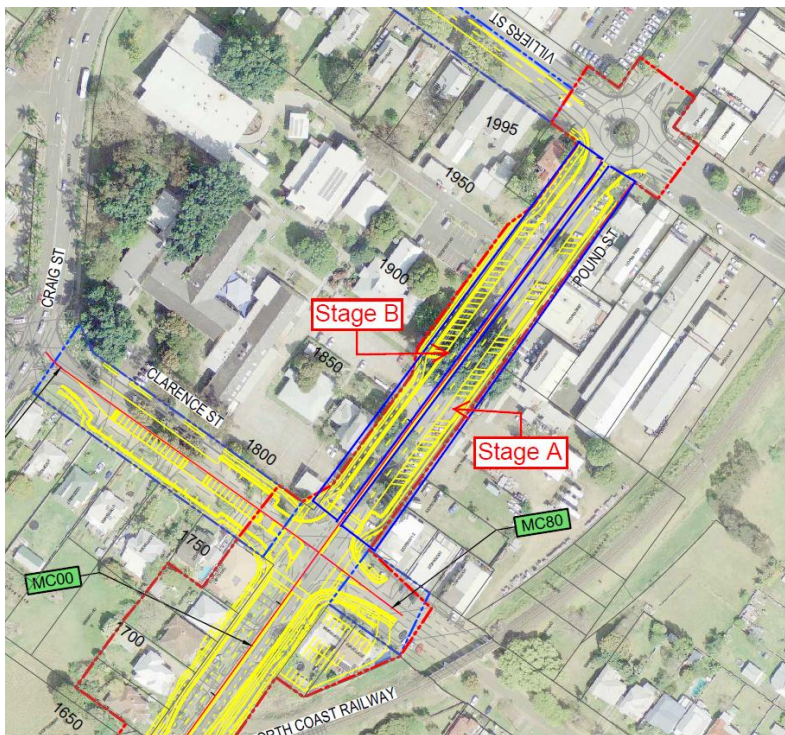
Alternative parking on Pound and Clarence Street
